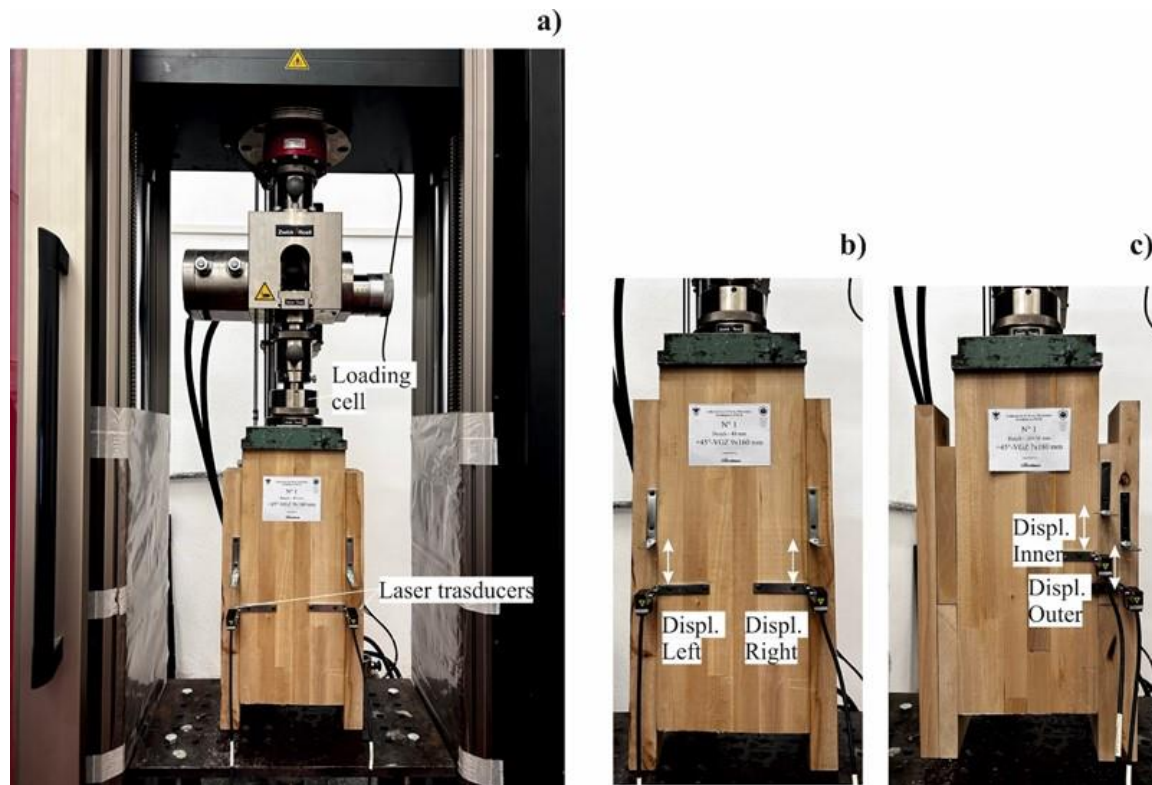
Tests: a) Testing instruments and loading machine; b) Single-layer planking: laser transducers position; c) Double-layer crossed planking: laser transducers position.
